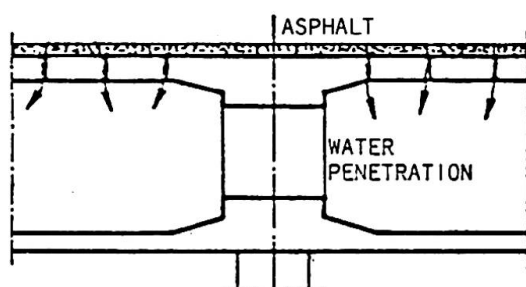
BRIDGE DECK WITHOUT WATERPROOFING
